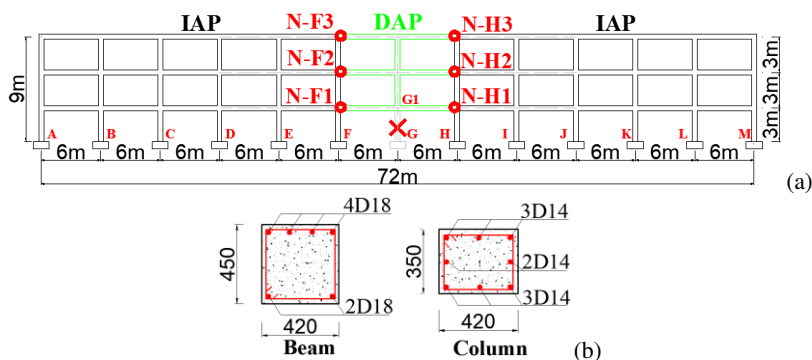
Frame F3B12: (a) layout of the frame (dimensions in m); and (b) cross-sections of beam and column (dimensions in mm).
